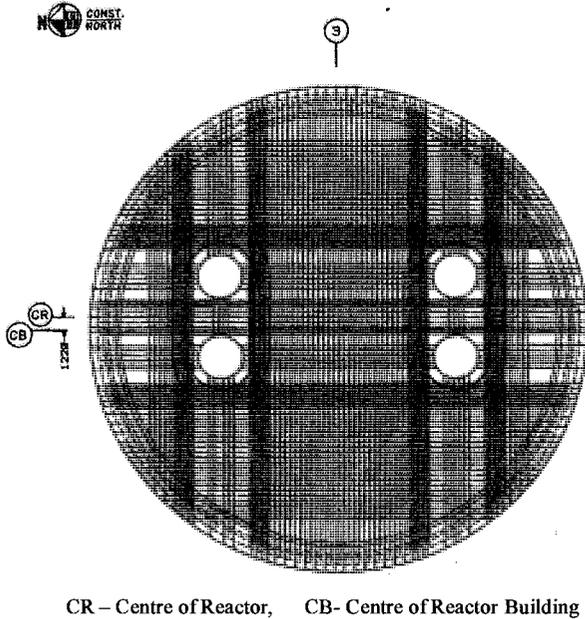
PRESTRESSING CABLE LAYOUT IN IC DOME
